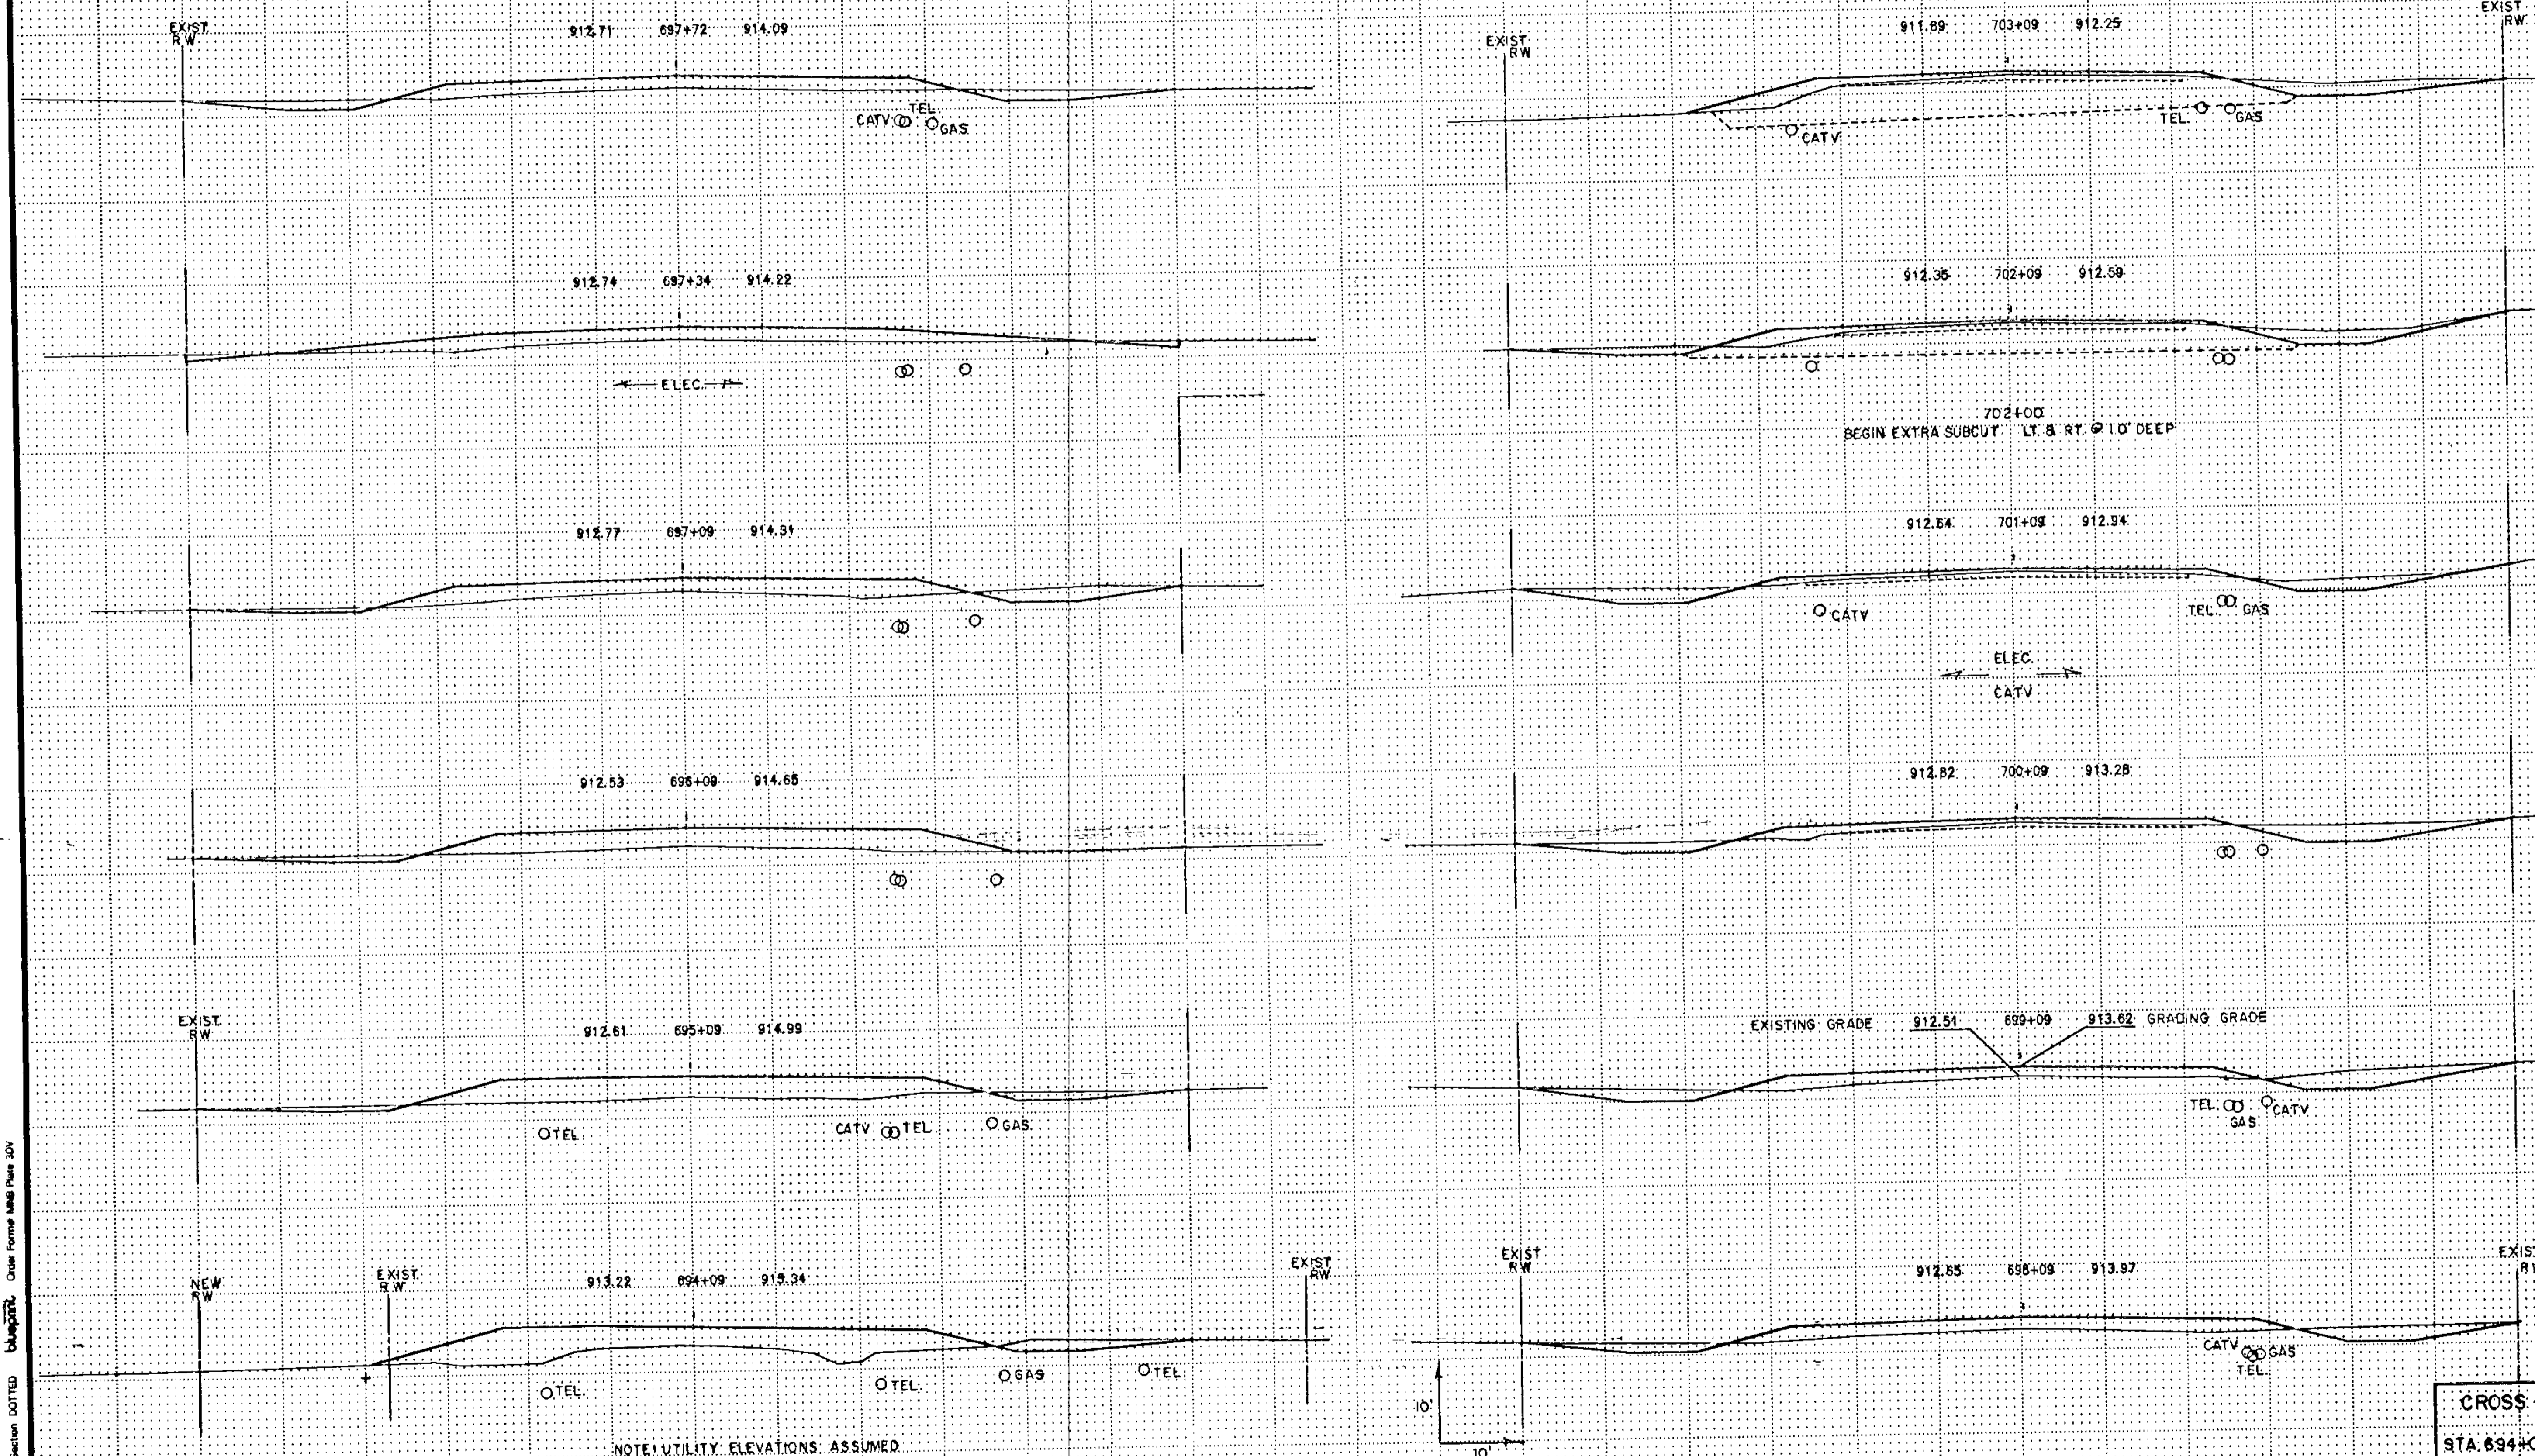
Full Cross Section UNITS Draw Form 1488 Plate 307
